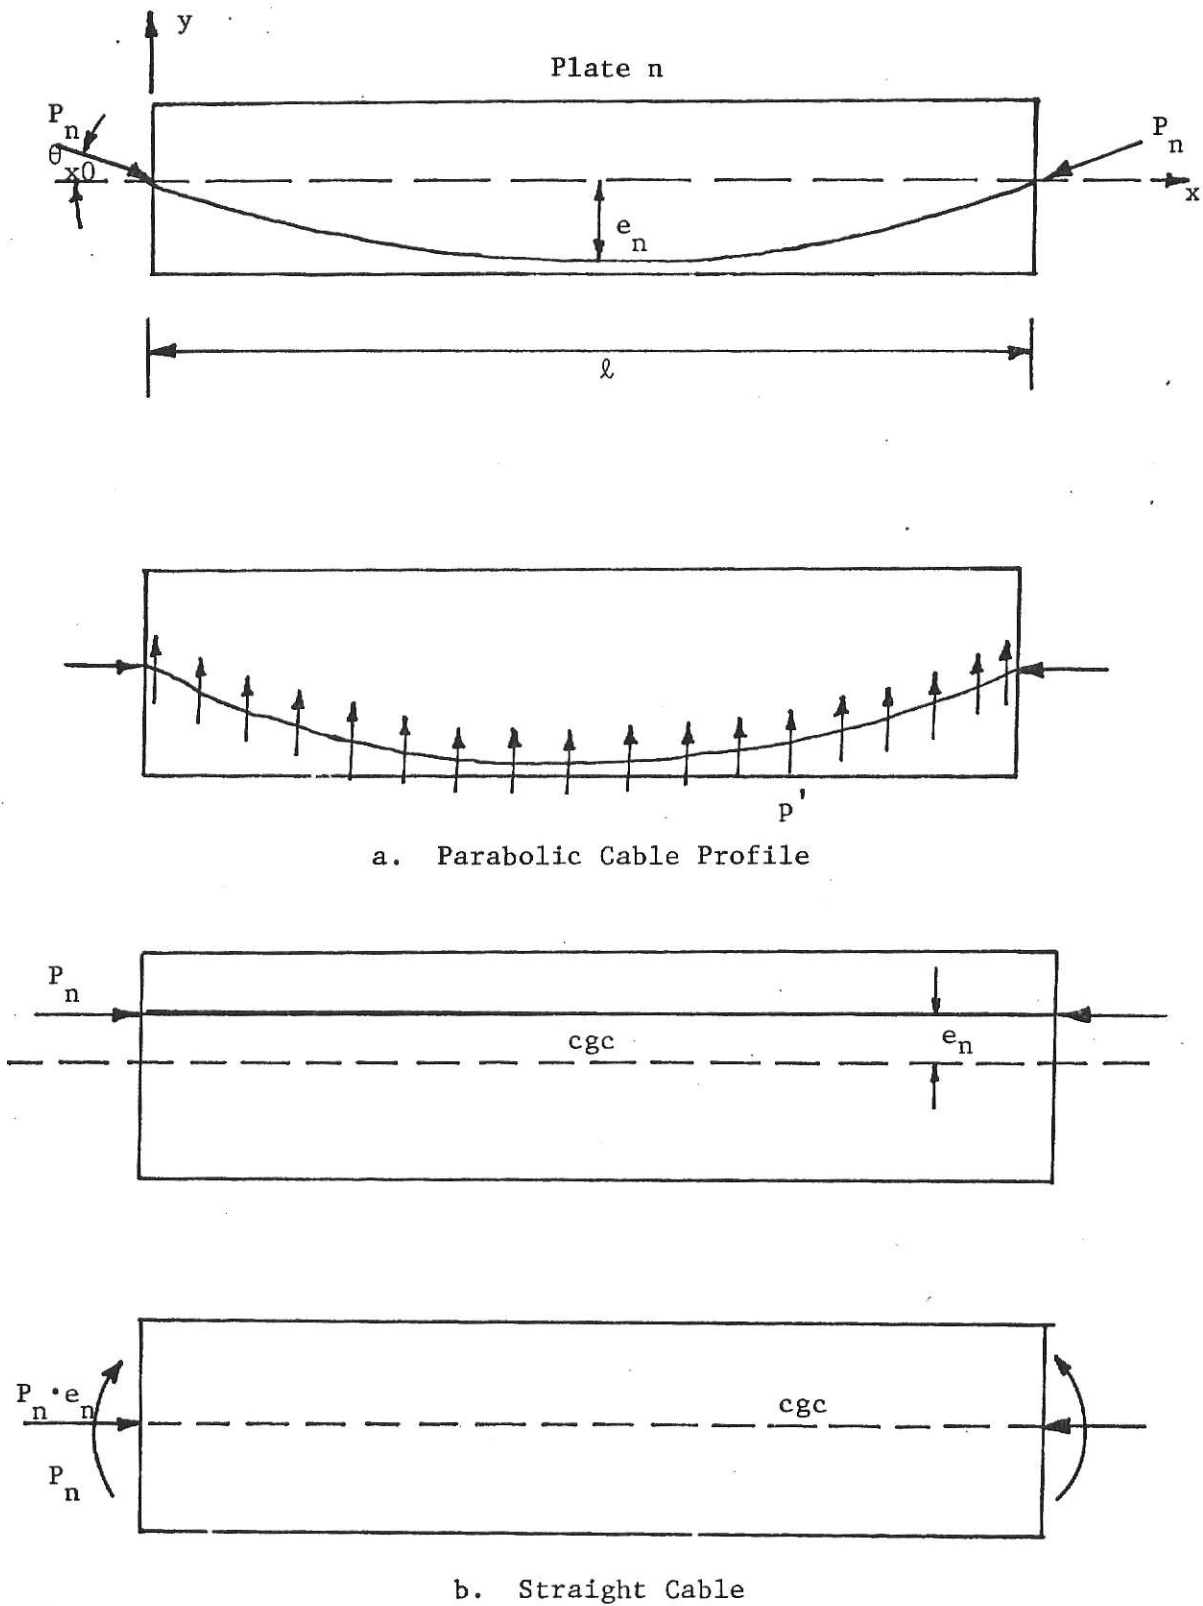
Induced Plate Loads Due to Straight or Draped Prestressed Cables
